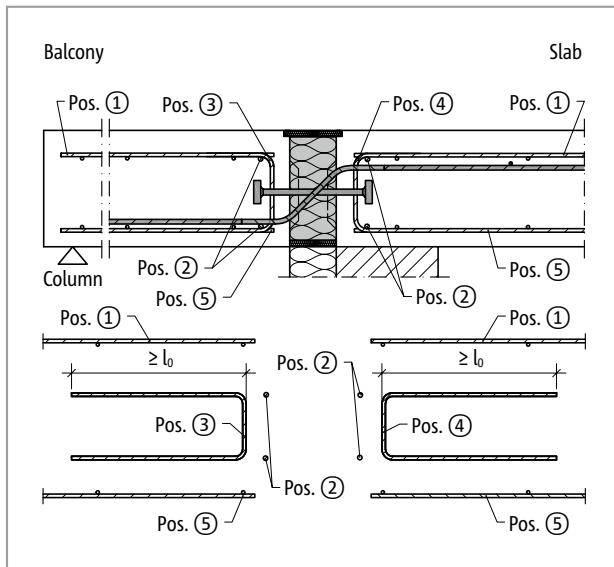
Schöck Isokorb® T type Q-P: On-site reinforcement
